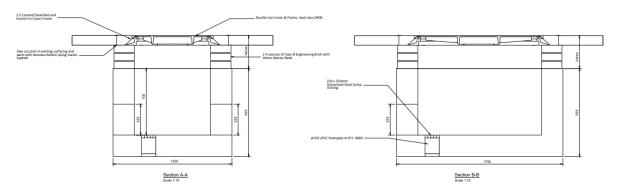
Typical detail of a link box chamber – extracted from planning drawing no. 229100714-MMD-00-XX-DR-C-0055
